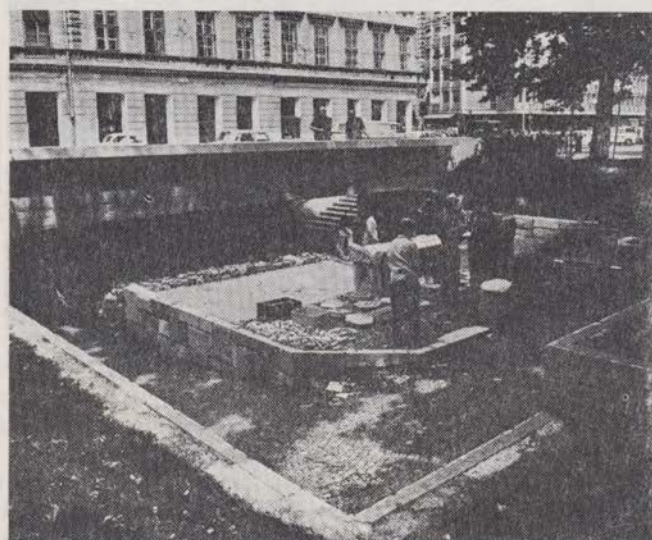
The mosaic before the transfer and two details; below: the back side of a sexagonal element with a date, drawn in concrete (July 1, 39), and an element with a damaged little bee, later reconstructed in resin (fig. 2-6 and 9-11 photo J. Gorjup)
